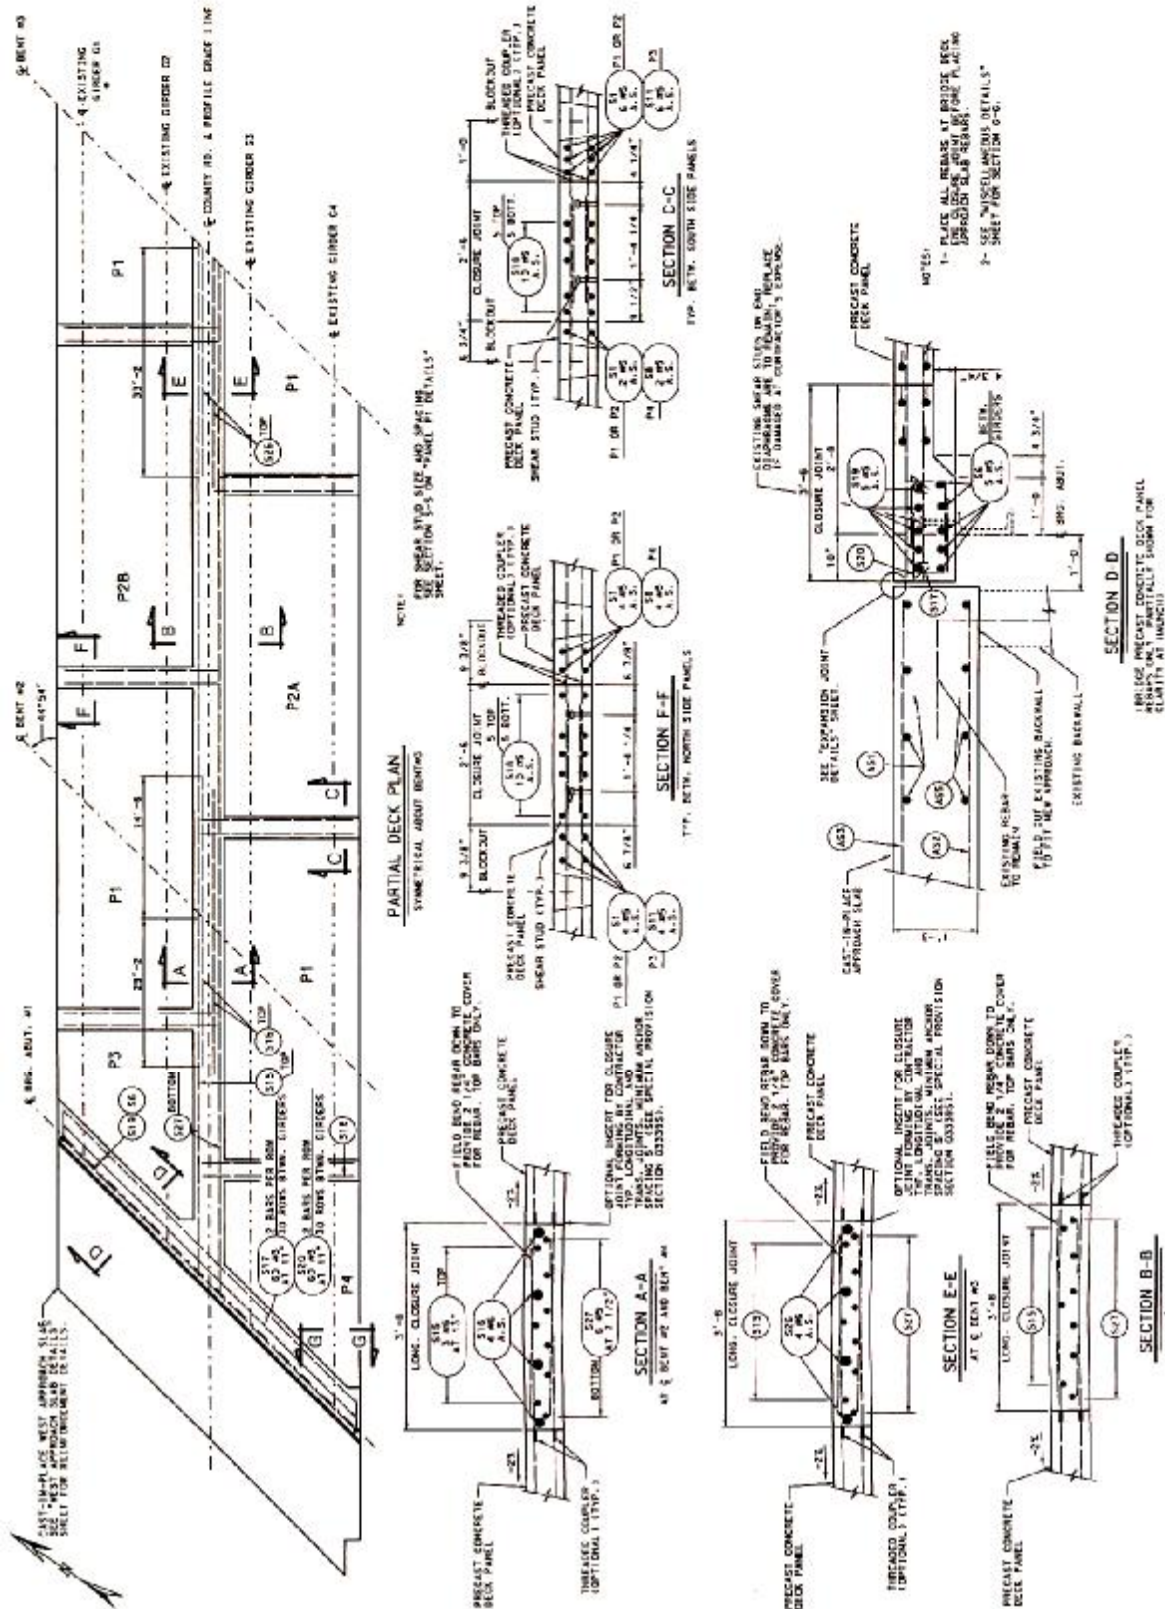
Details of the transverse and longitudinal joints between the precast panels
